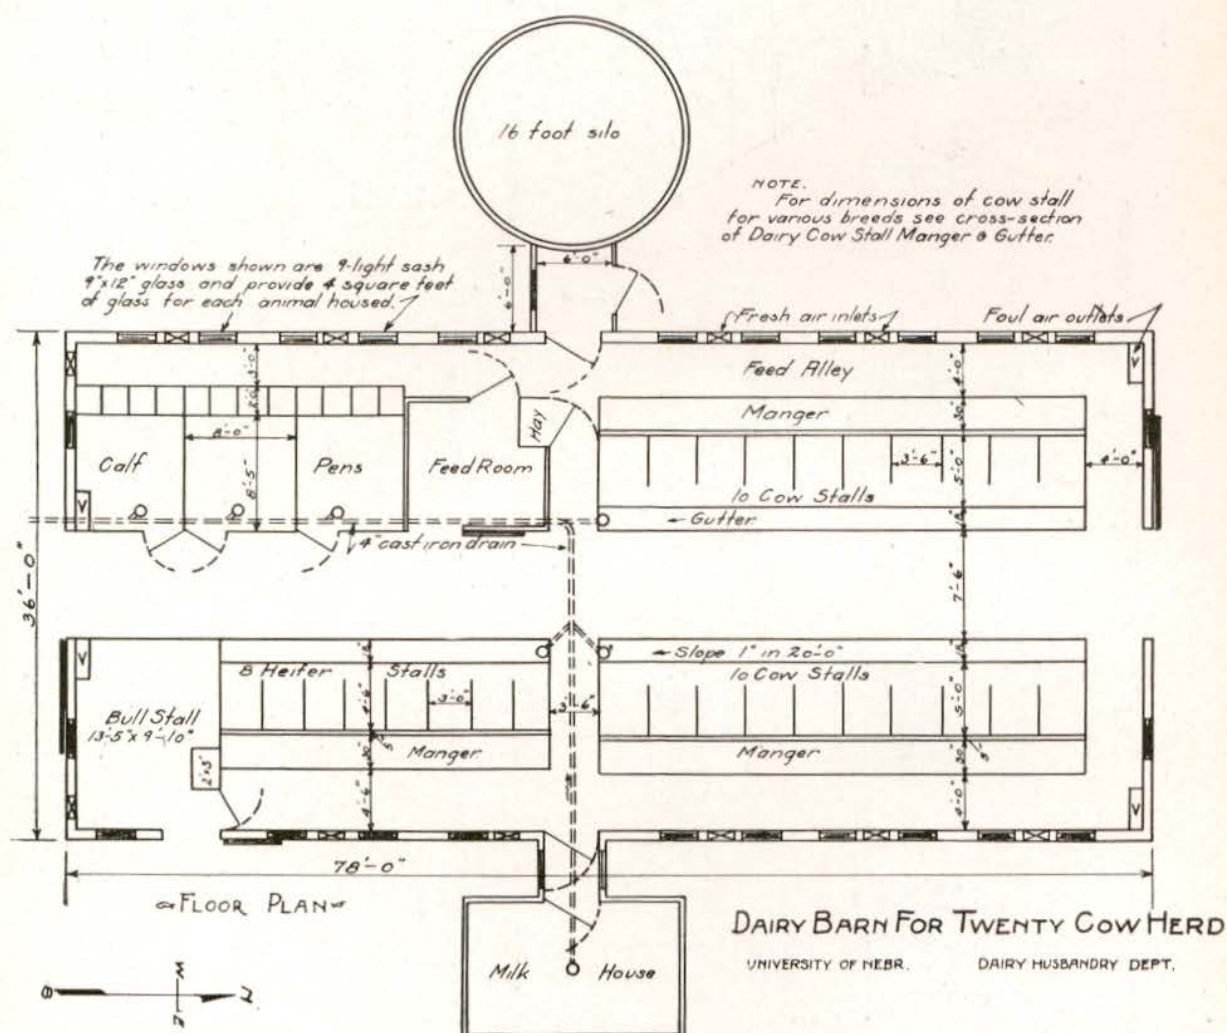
SUGGESTED ARRANGEMENT OF FIRST FLOOR IN BARN OF TWENTY-COW HERD
